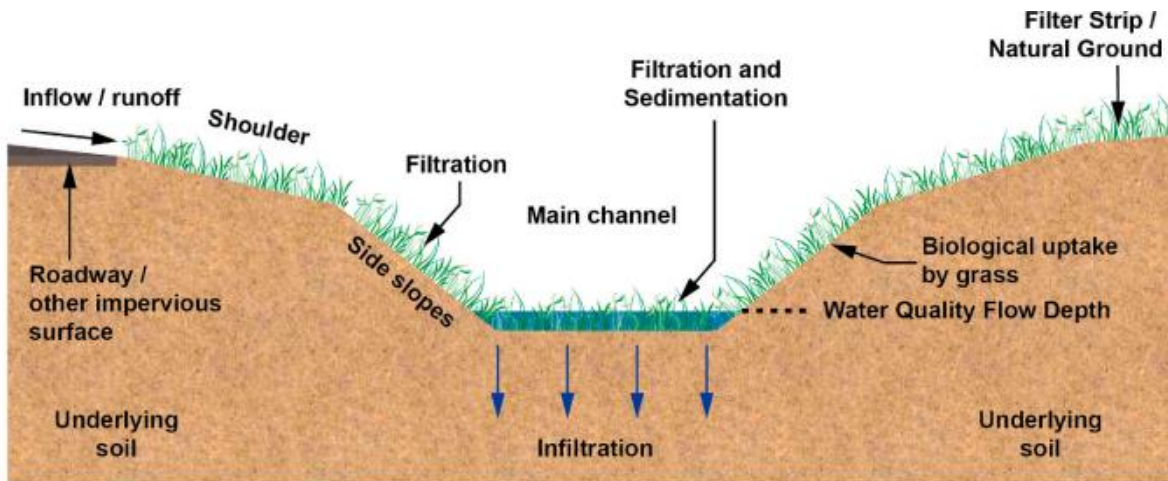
Typical grass swale cross-section (Ekka et al. 2021)
